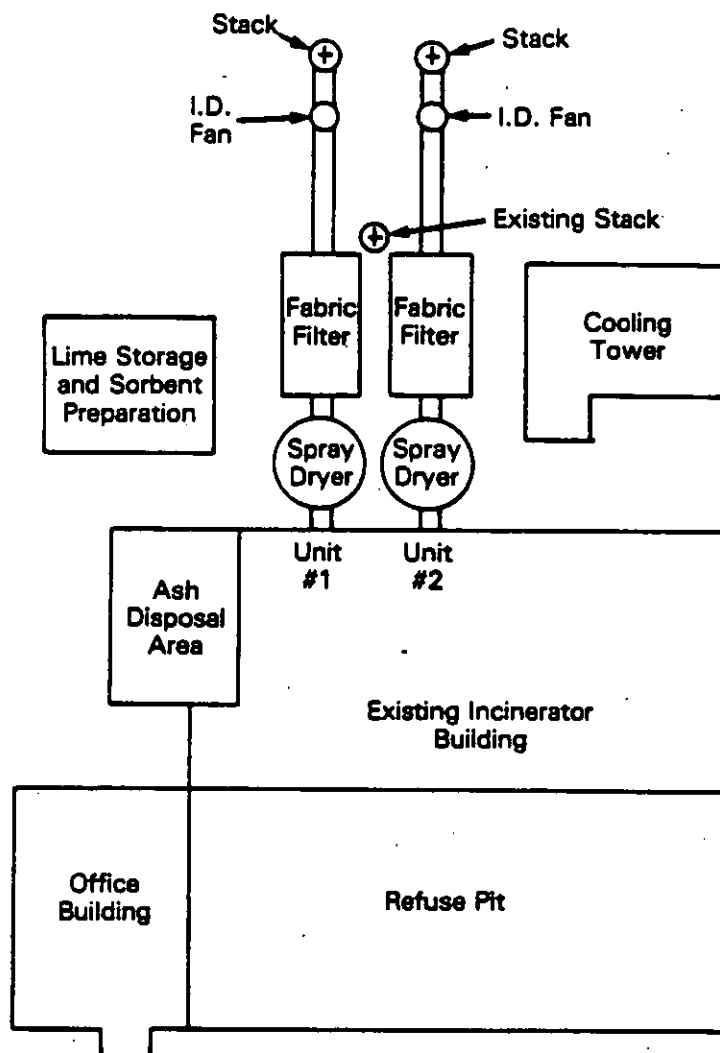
Plot plan of spray dryer/fabric filter retrofit equipment arrangement.
